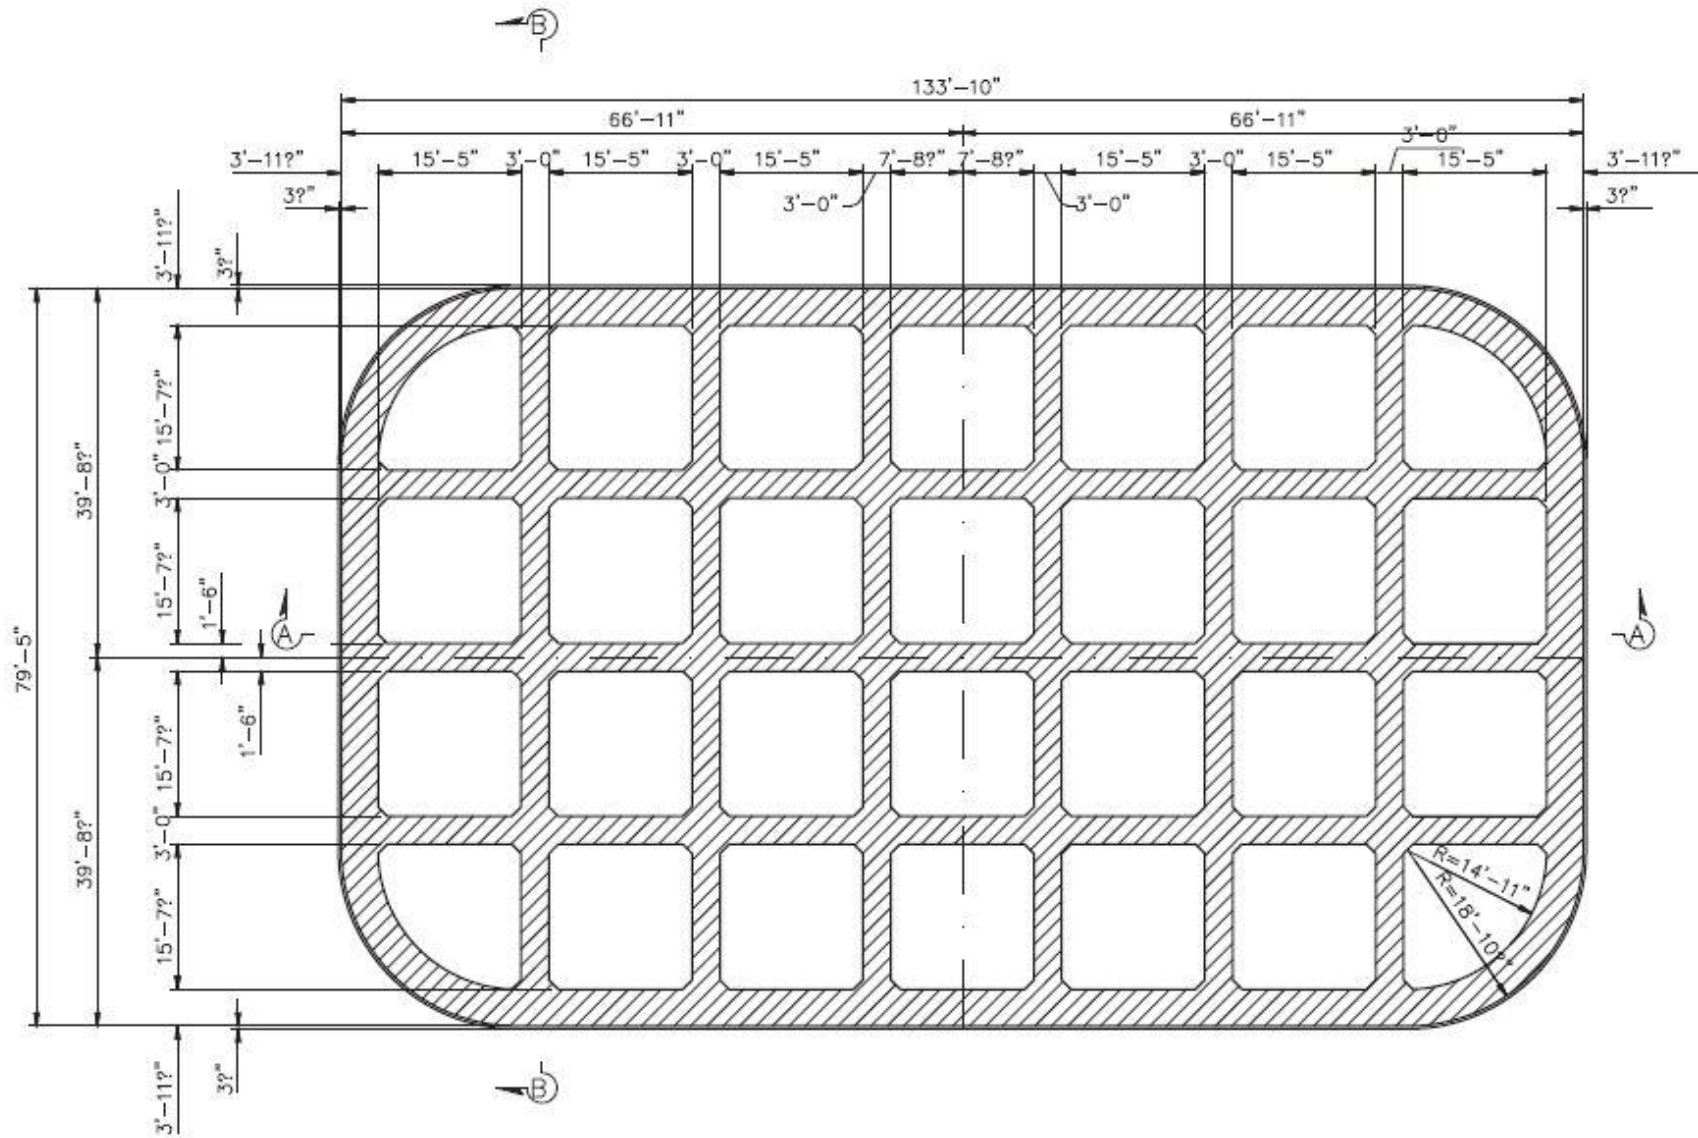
Exhibit D. Top view schematic of the upper and lower concrete caisson cell structure of Pier E3.
